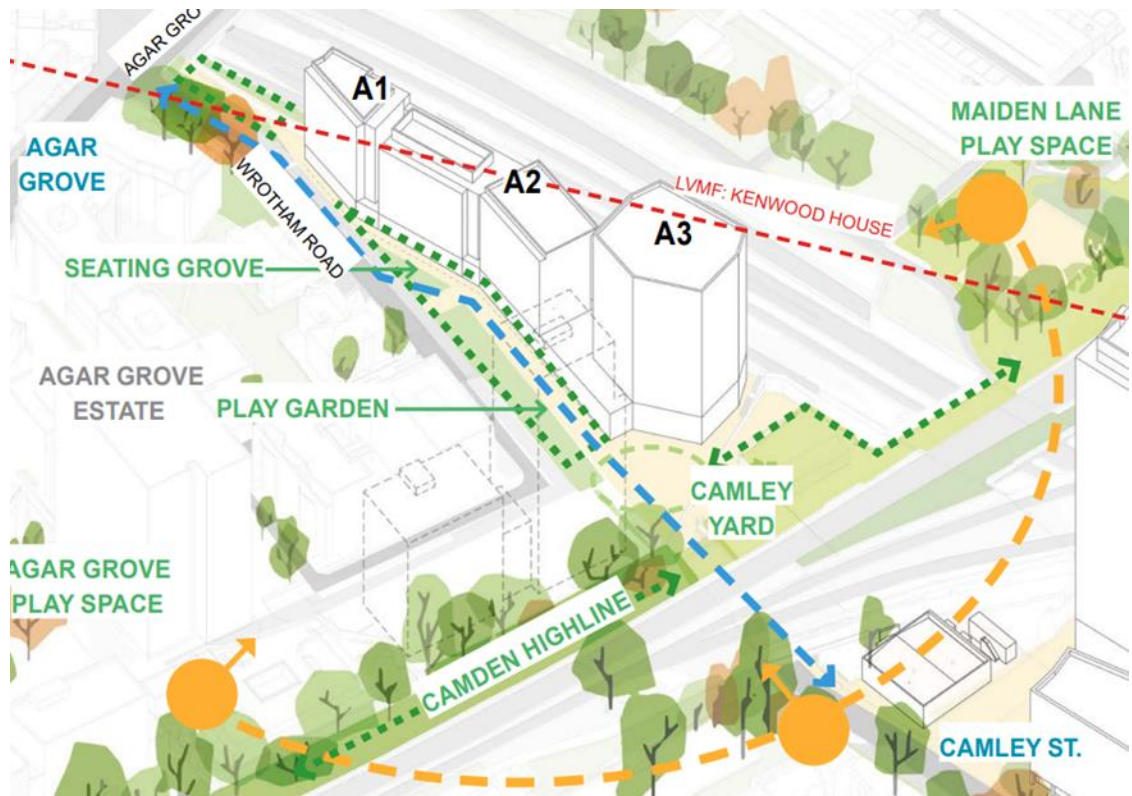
Proposed public realm demonstrating the improved connections to Maiden Lane, the proposed Camden High Line and through the site to Agar Grove (and LVMF)
